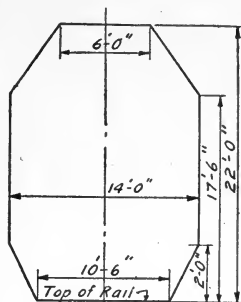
Vertical Section of Clearance Dimensions on Bridges.
